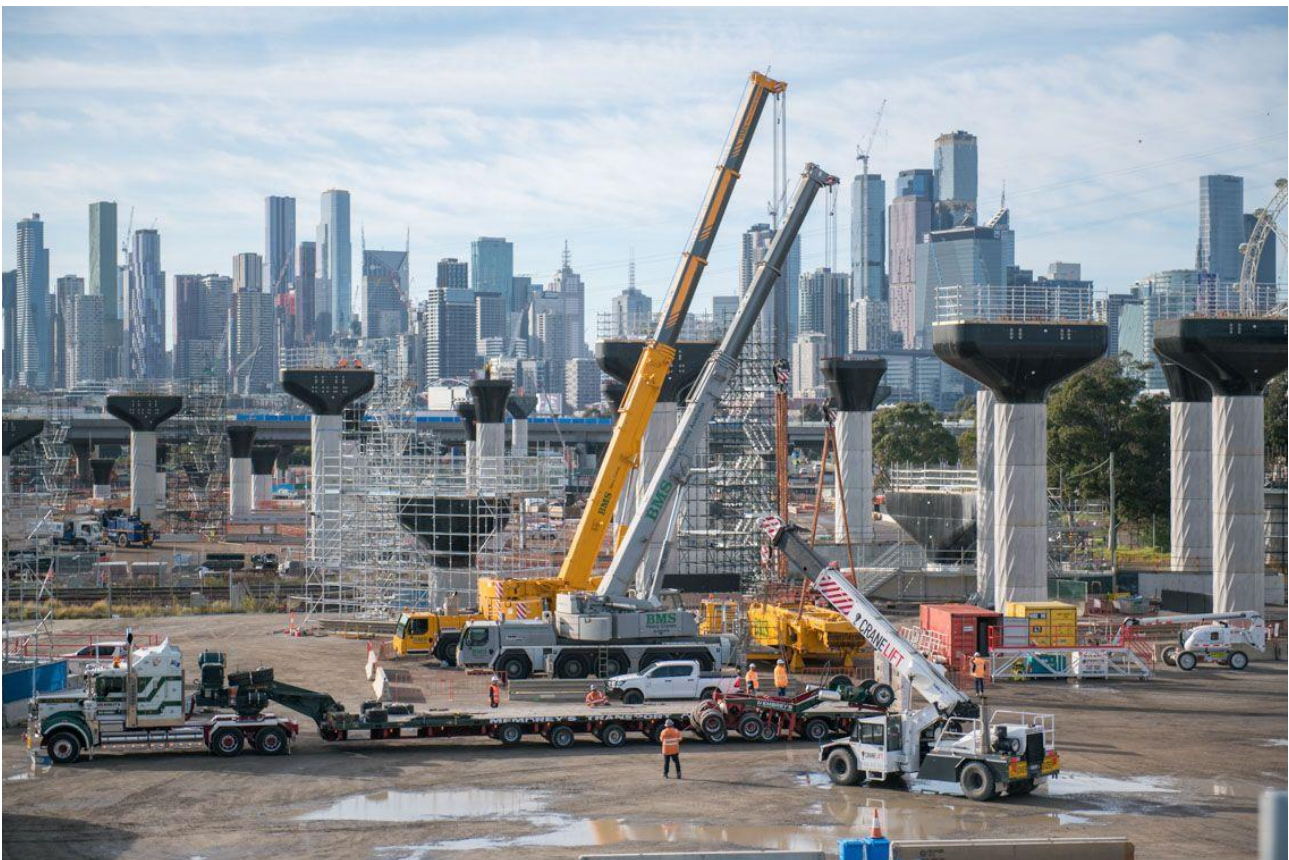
Wurundjeri Way – East Zone (Source: WGTP MTIA, 2 August 2022)
